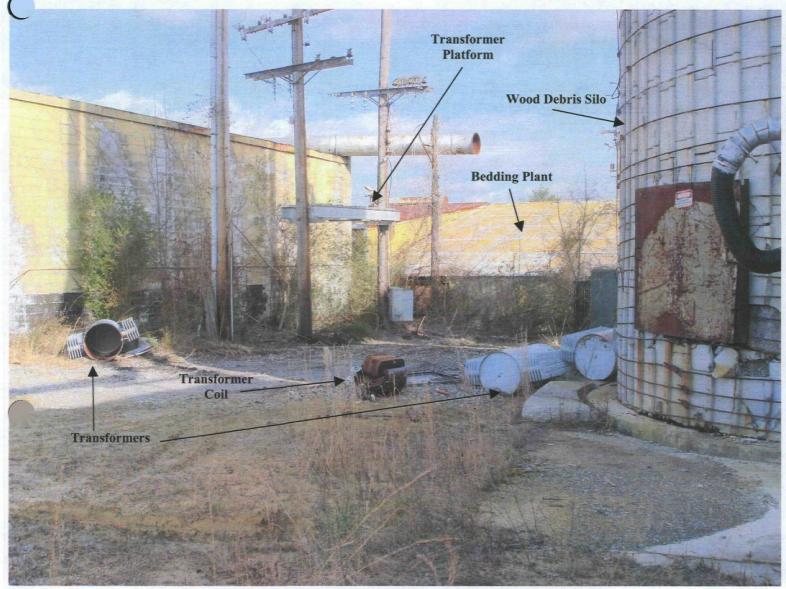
View facing east, the transformer platform and vandalized transformers, located near the wood debris silo and bedding manufacturing building.
